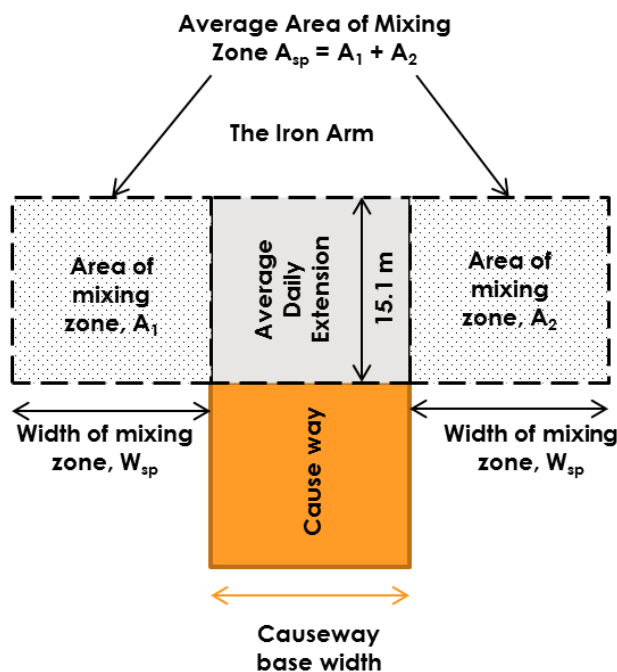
Simplified Plan View of the Mixing Zone during Causeway Construction
